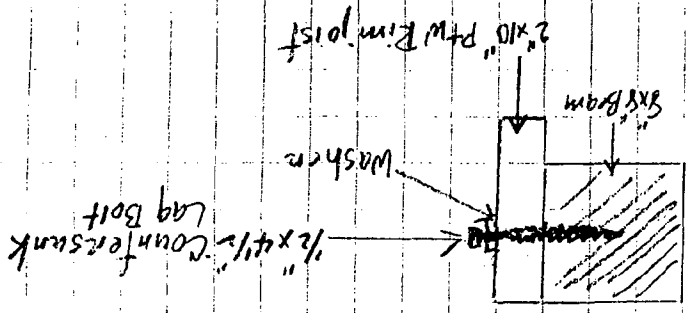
Rim joist attachment to house beams Magnified view not to scale
